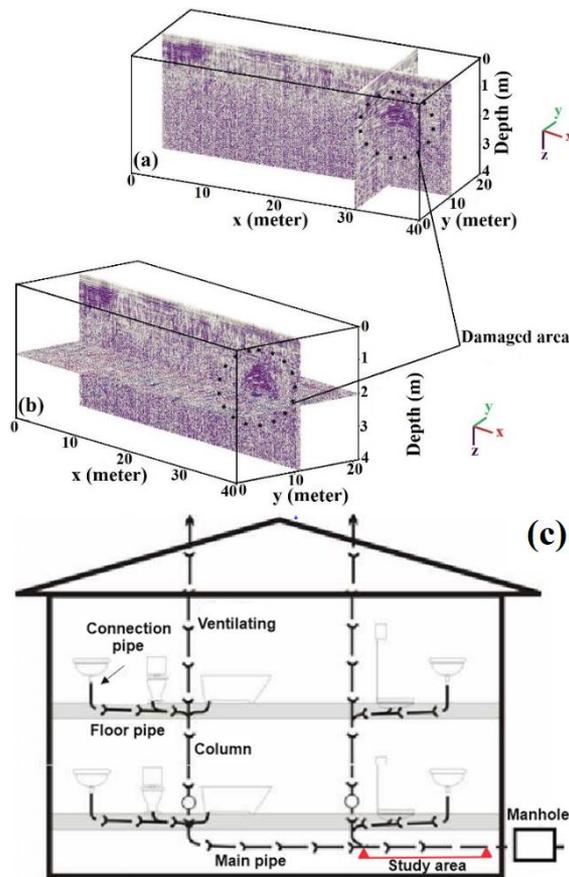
a) 3D image of damaged area by intersection of X and Y sections, b) Slice image of damaged area by intersection of Y section, c) Indoor wastewater installation pipe sections and representative study area (designed from URL-1, 2018).
